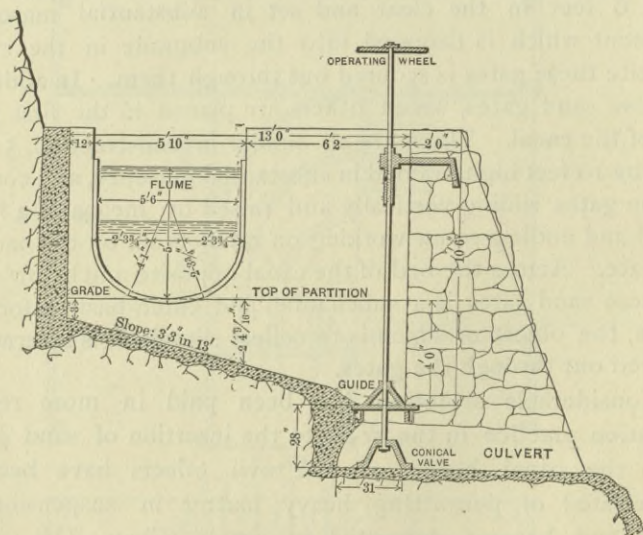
CROSS-SECTION OF SAND BOX, SANTA ANA CANAL.
